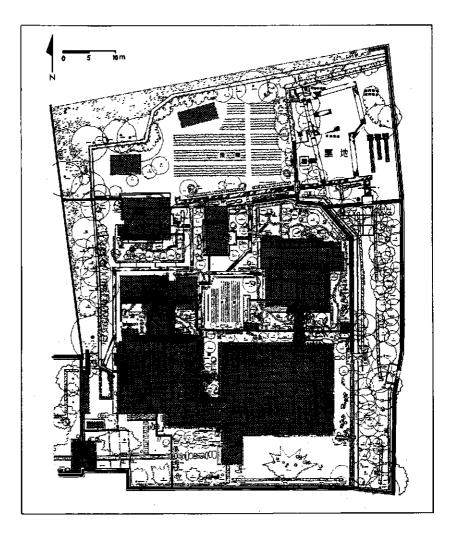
Plan of the subtemple Shinju-an in Daitoku-ji, Kyöto. Buildings are indicated with a screen tone, walls with thick, black lines. The plan shows the typical spreading lay out of the buildings of a subtemple that greatly vary in size. In between the buildings and walls are a great number of small yards, some of them made into a decorative garden, as can be seen to the south and the west side of the main hall that lies in the south-west corner. A grave yard is found in the north-west quarter. The area in use as a vegetable garden is indicated with a texture of waving lines. (Plan dated 1956.)
